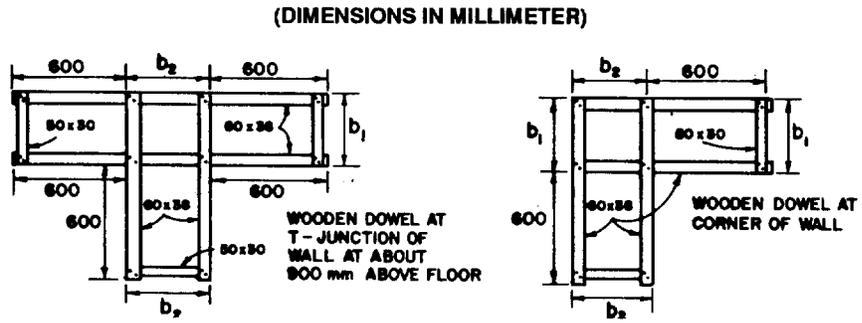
Detail of wood reinforcing at corners and T-junctions
